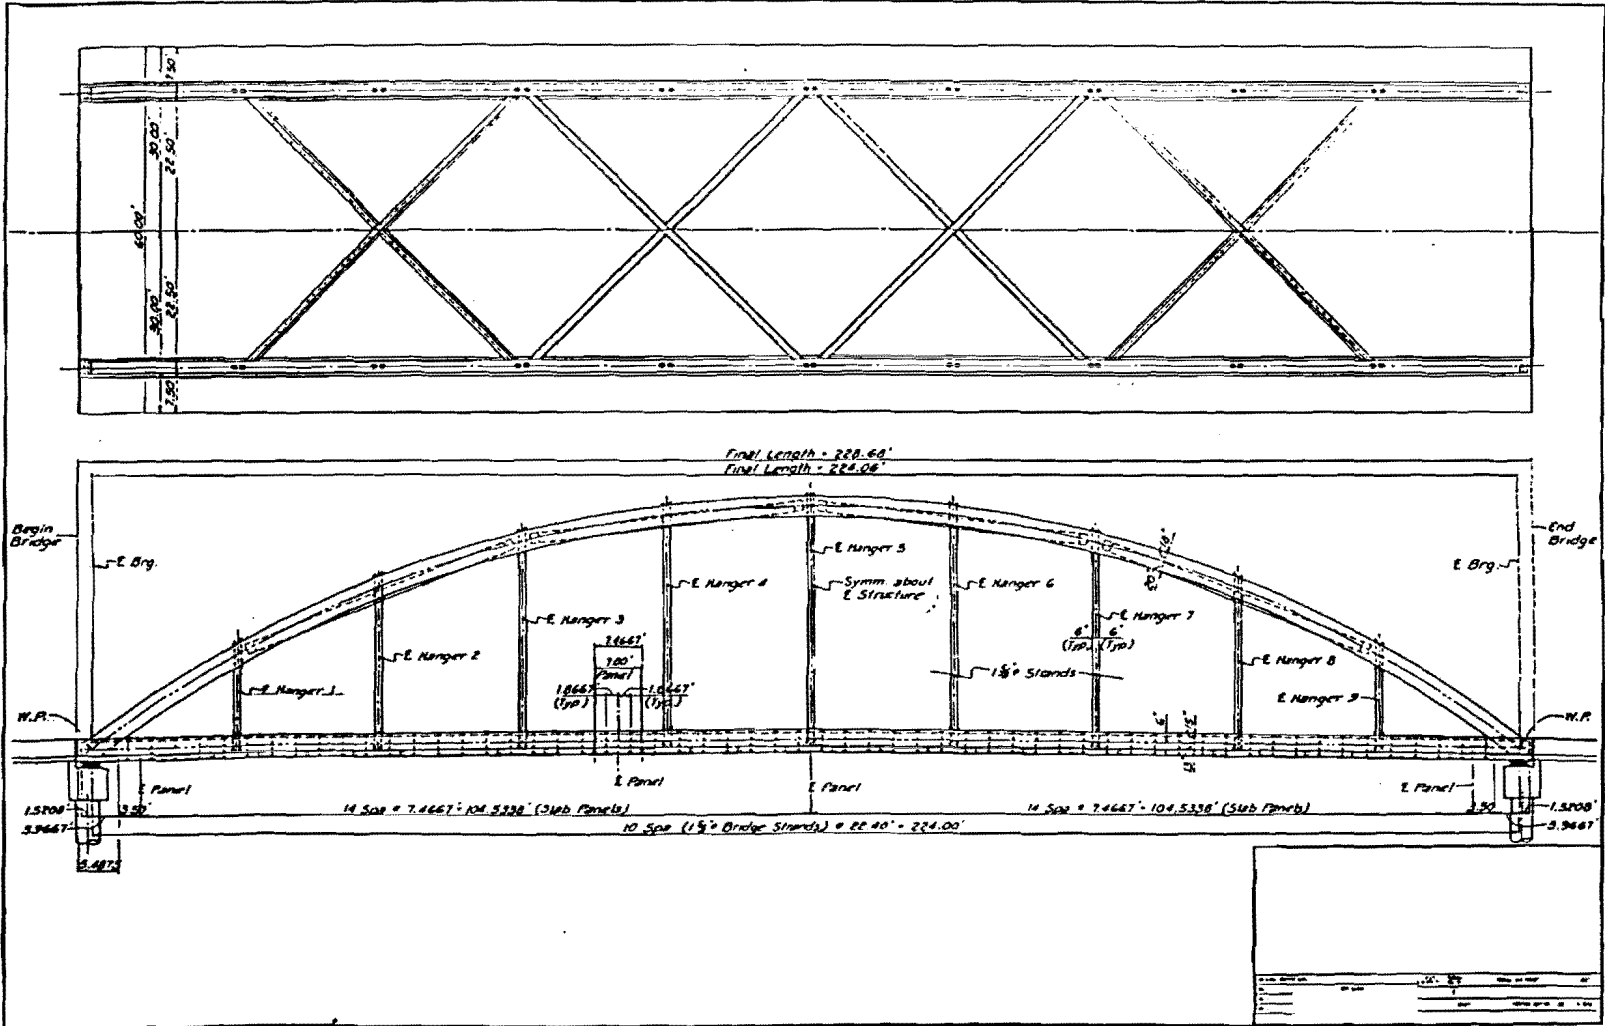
Plan and Elevation of a Typical Tied Arch Bridge (Houston District, TxDOT)
